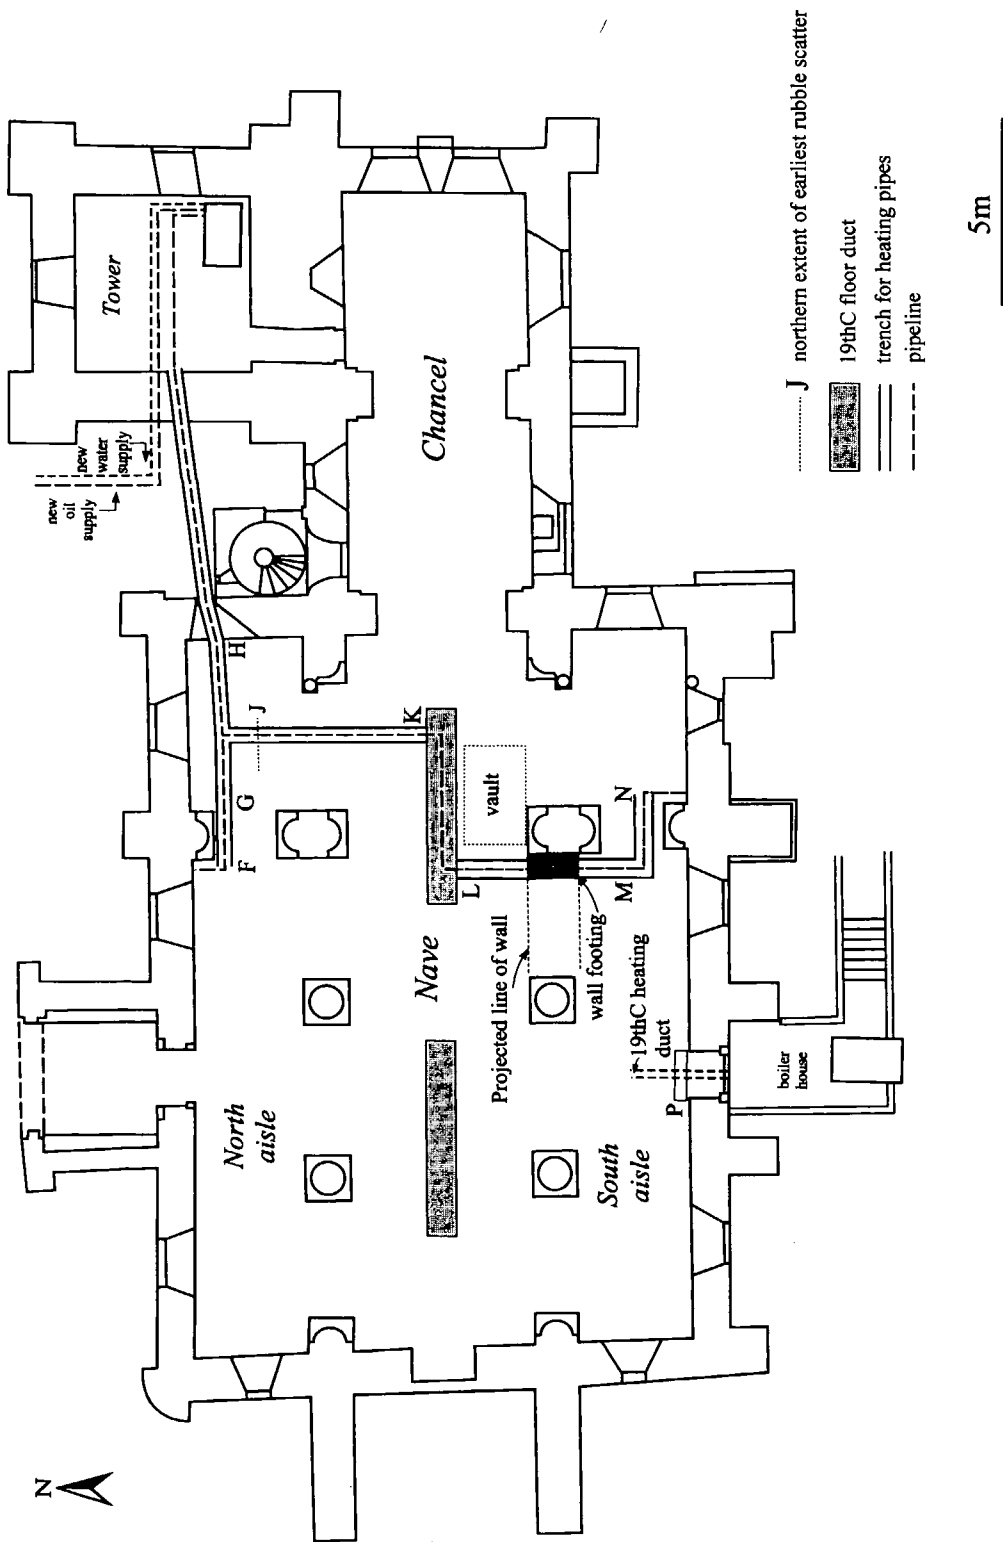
Crondall Church: plan showing location of pipeline trenches (based on a plan by M A Jeffries FRICS)
